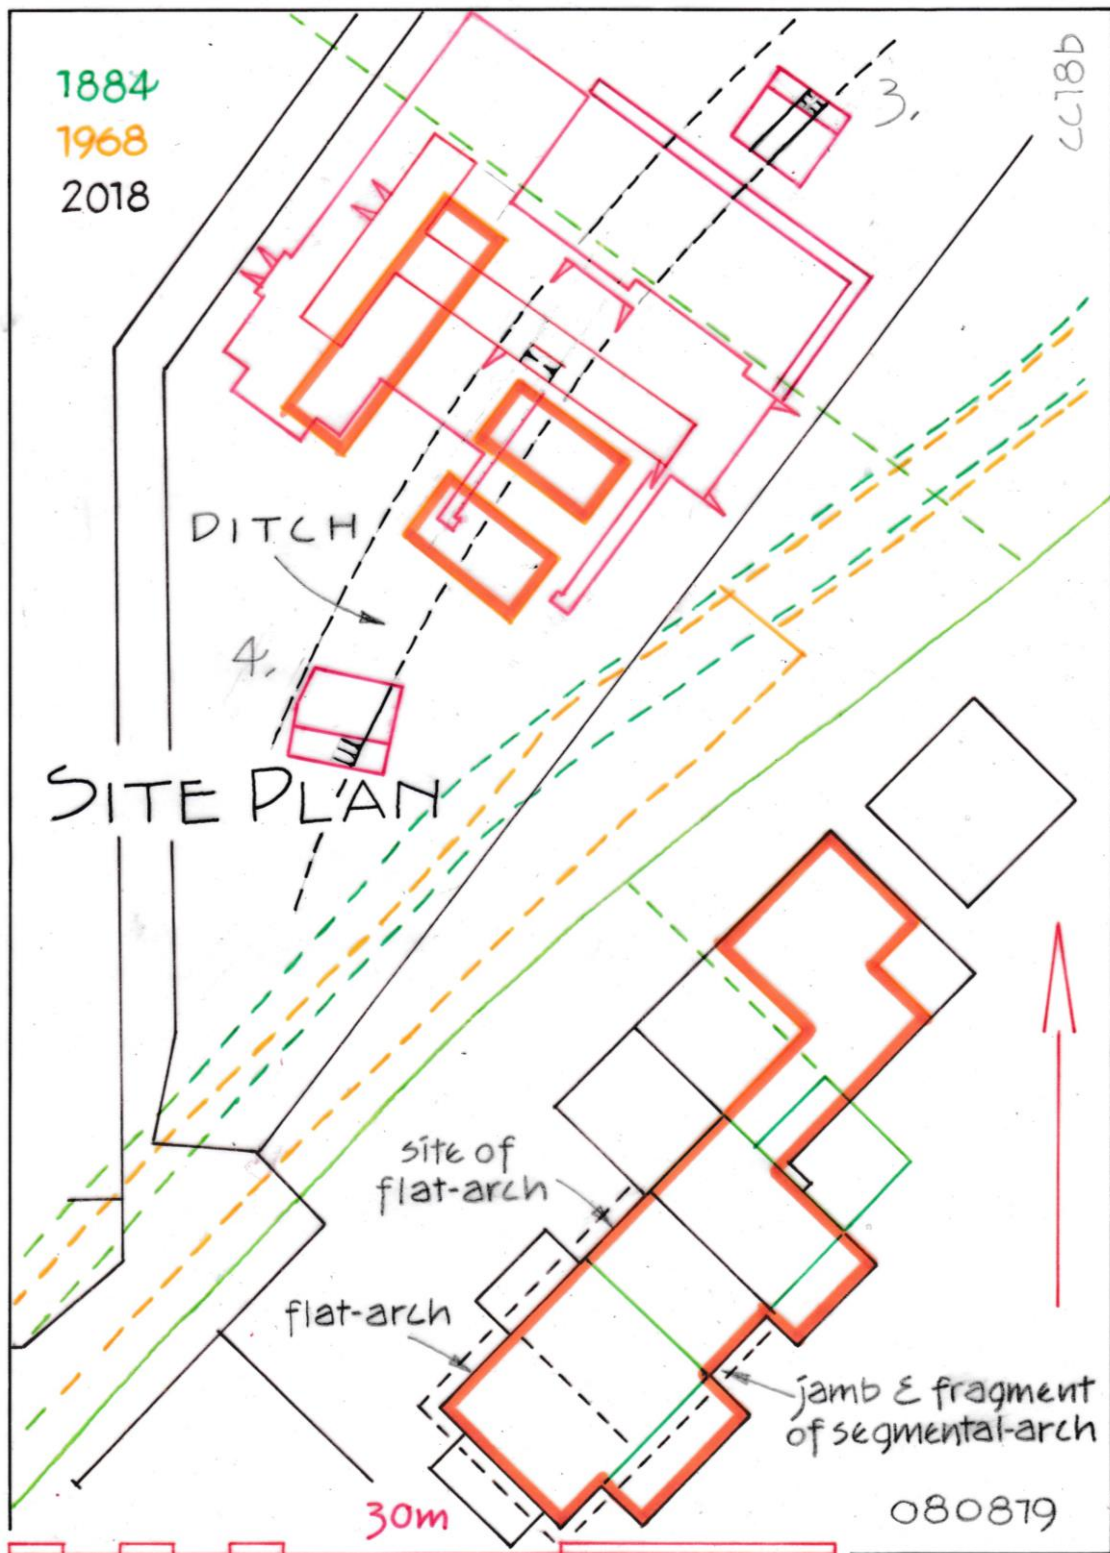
; site plan showing Owlet End and the location of the evaluation (trench 1), the strip foundations for the new dwelling (trench 2) and drainage (trenches 3 & 4)
